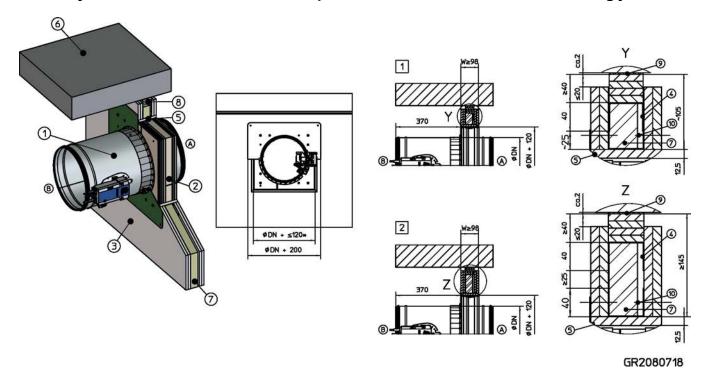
Dry mortarless installation in lightweight partition wall with square installation kit TQ and flexible ceiling joint (drawing shows flexible ceiling joint acc. to DIN 4102)
